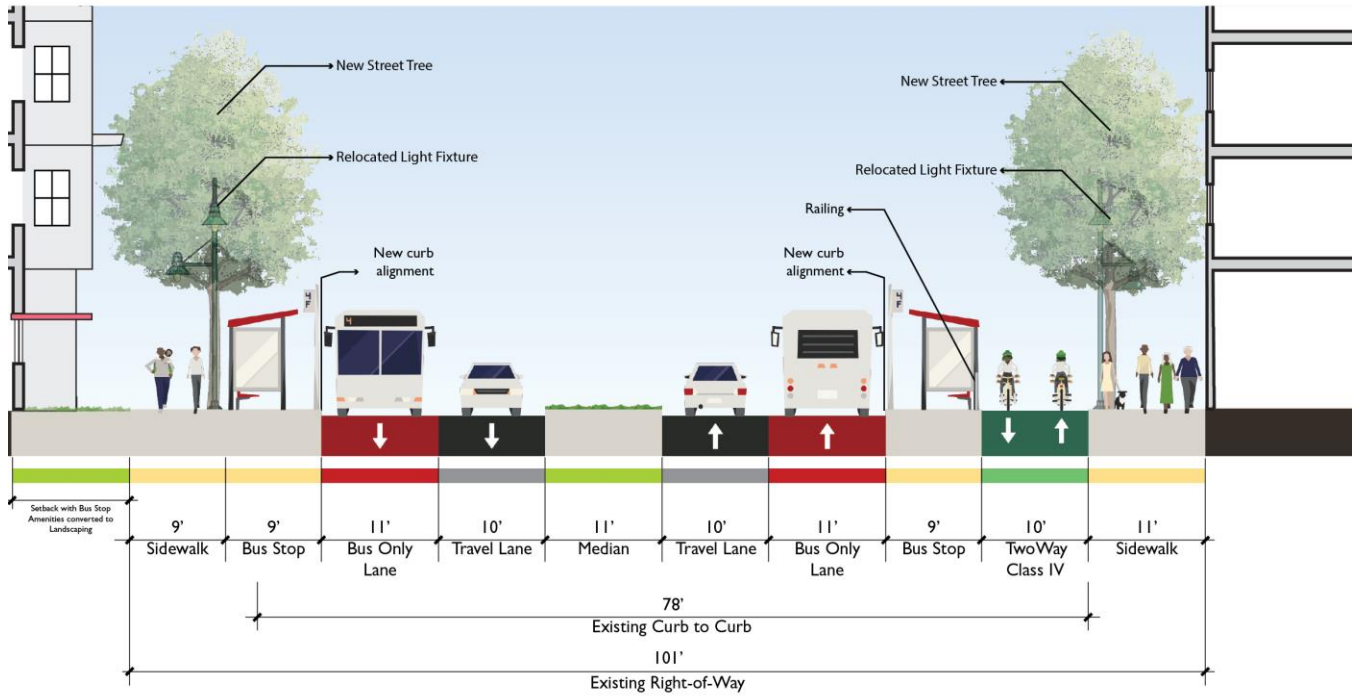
40th Street between Adeline Street and San Pablo Avenue (looking west) – SECTION B
